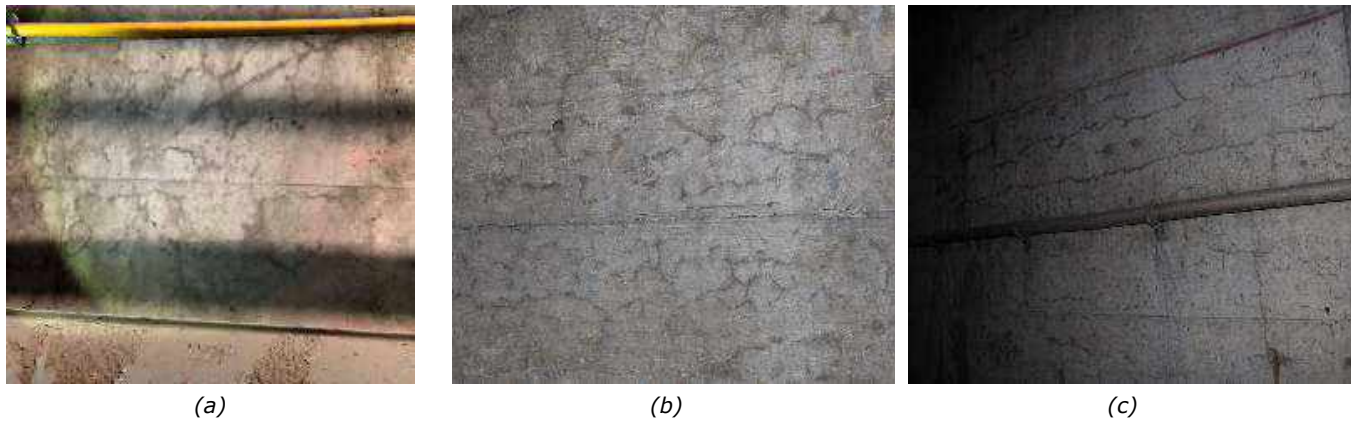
Examples of observed map cracking on outer walls of the air duct tube including at (a) Upstream Air Duct, Element IV, Door 24 (core WUE-P4 taken at this location), (b) Downstream Air Duct, Element II, Door 14, and (c) Downstream Air Duct, Element IV, Door 24.
